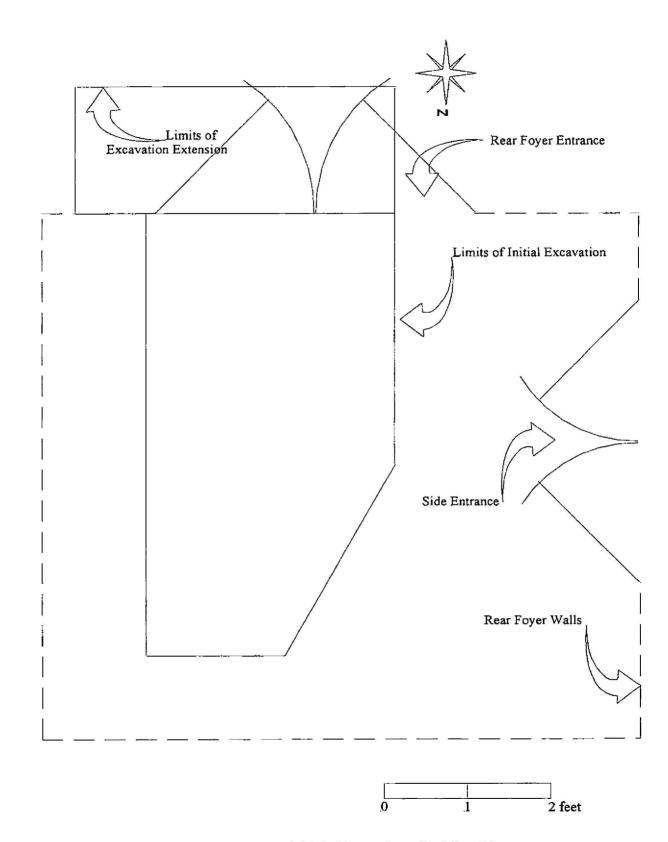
Excavations beneath mortared brick inside rear door of Building 298.
